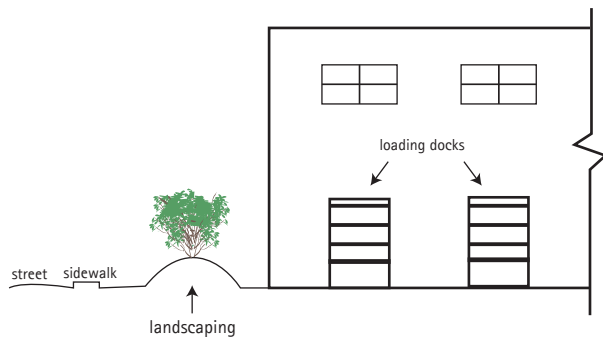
Landscaping, wall or low wall (schematic cross-section)
